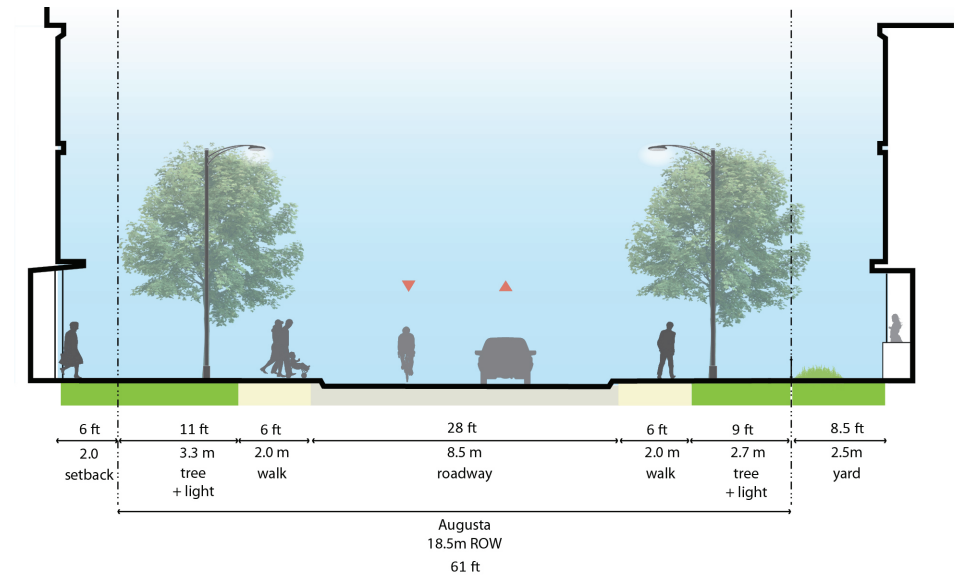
Section a-a: Augusta Street 18.5 m ROW
